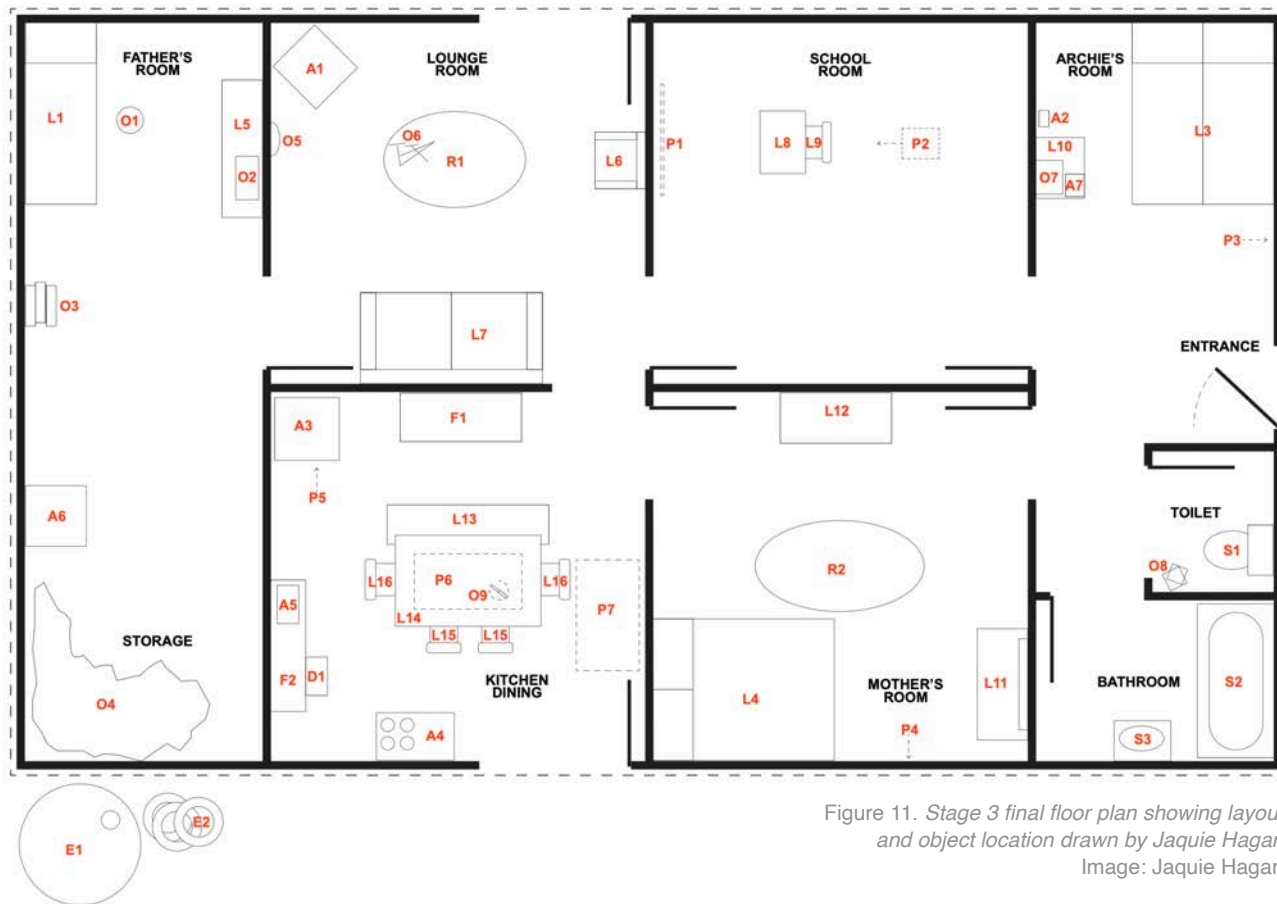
Stage 3 final floor plan showing layout and object location drawn by Jaquie Hagan
